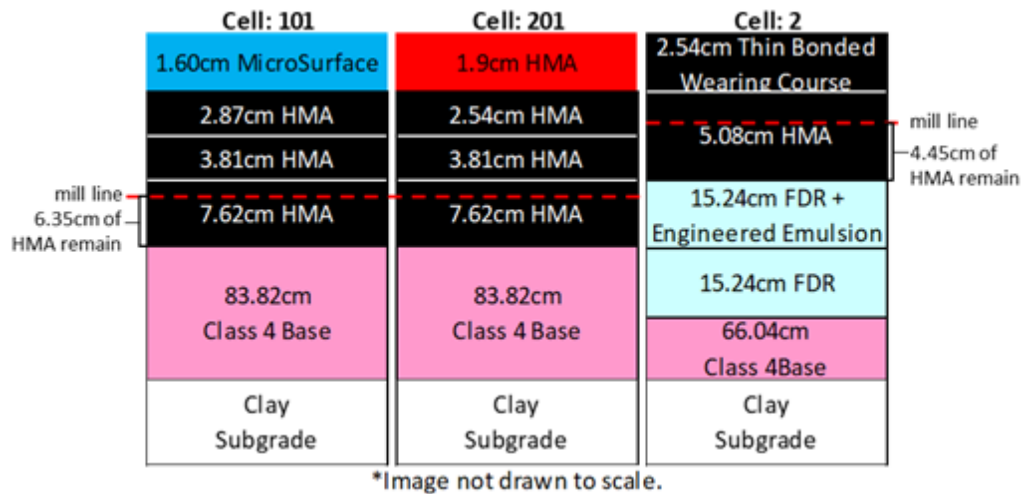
Pavement Structure Cross-Sections of MnROAD Cells 101, 201, & 2
